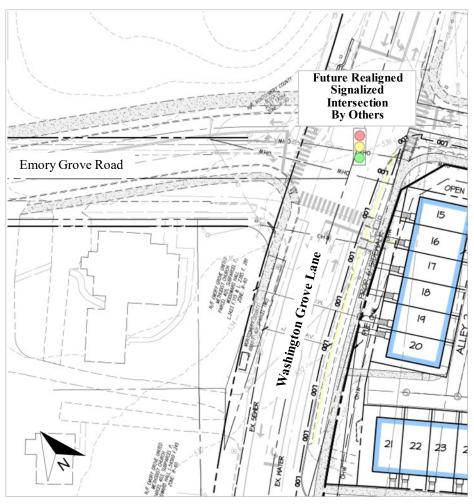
Location of Potential Washington Grove Lane and Emory Grove Road Intersection Realignment by Others
